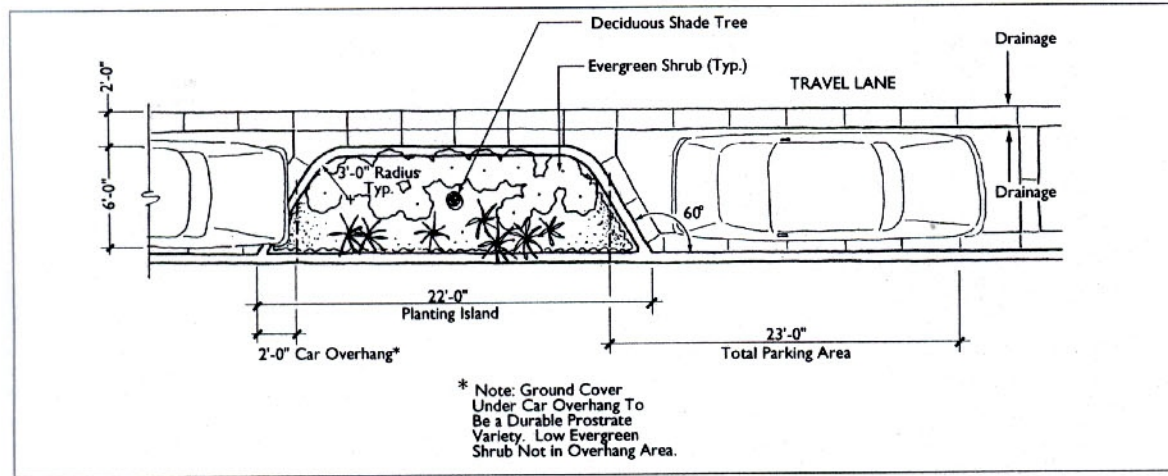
, Parking Lane Island. Larger parking islands on Sixth Street will separate parking every two spaces and will provide an attractive, enclosed canopy of trees over the travel lanes and sidewalks.
